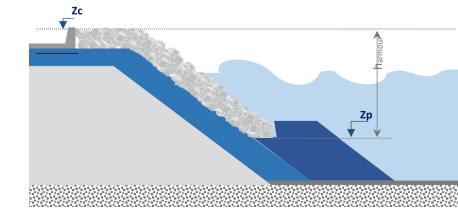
Schematic diagram of a cross-section of a breakwater with a raised toe foundation level.
